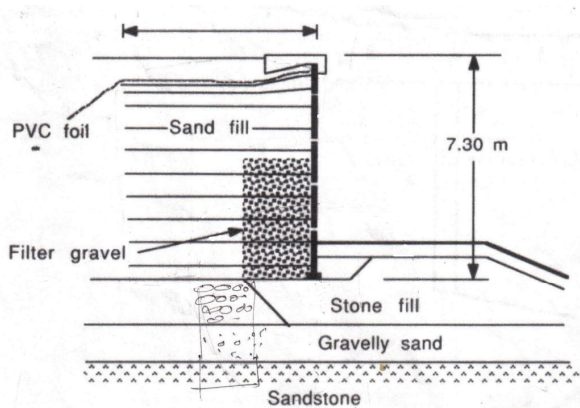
(e). Typical Section of RE wall on Rocky Subgrade.
